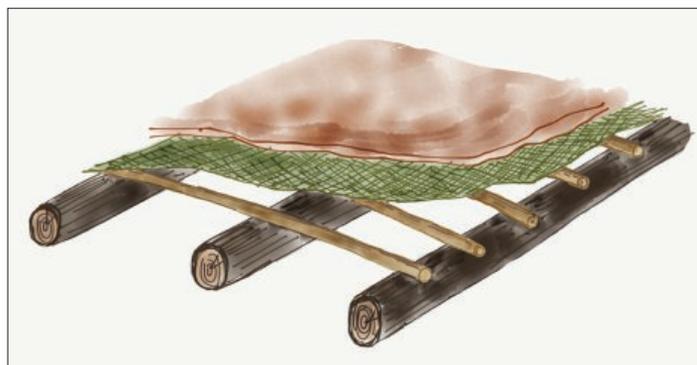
Reconstruction of the roof construction technique. (d09Z3-1460)
